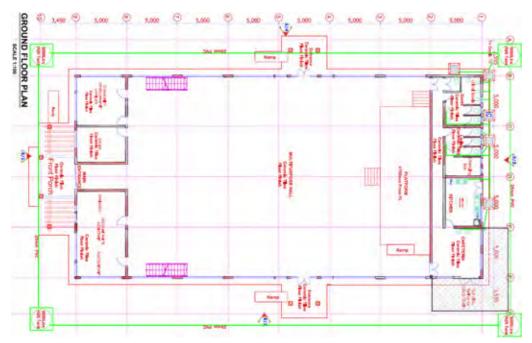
Ground floor Plan of the Multi-purpose Hall
